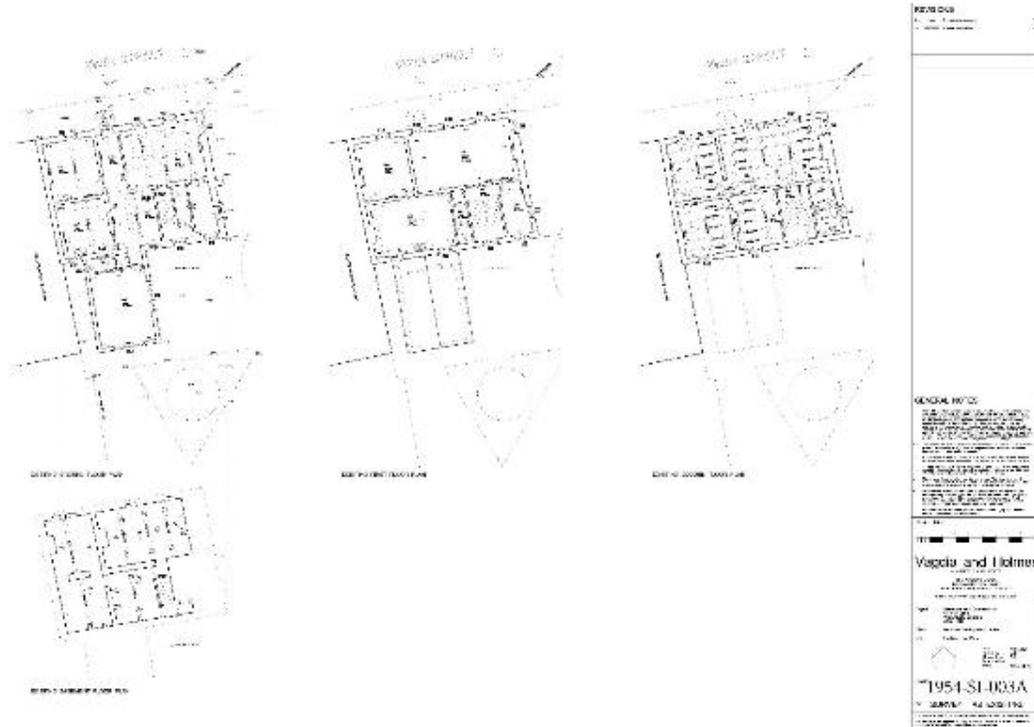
Existing Floor Plans Drawing ref: 1954-SI-003A
